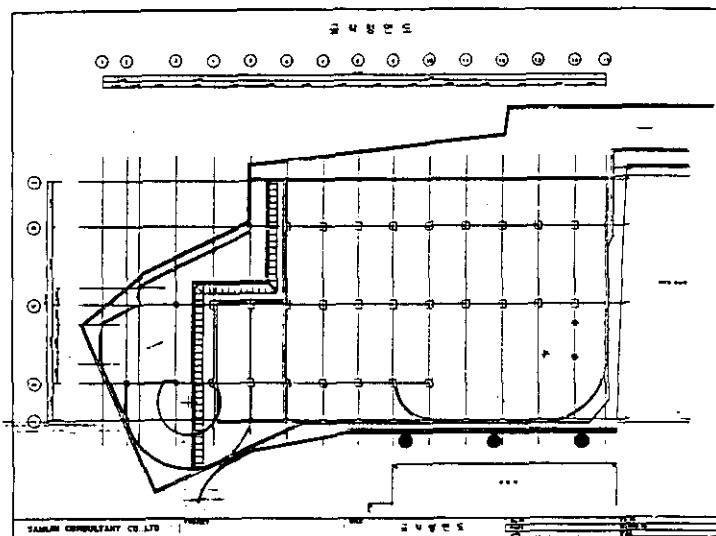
Plan view of excavation site and locations of instruments(Kidokgyo Hall)
